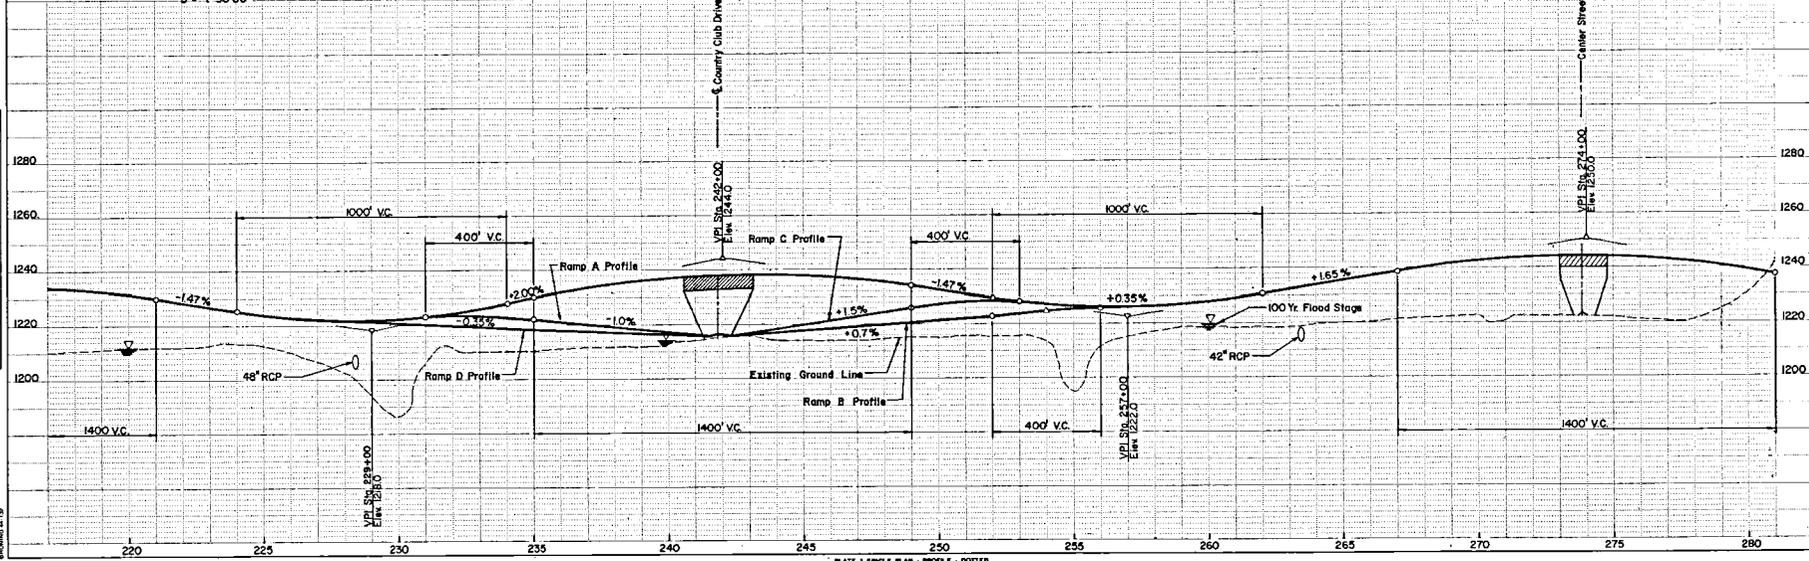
SINGLE PLAN, PROFILE, DOTTED CENTERLINE CONTACT
